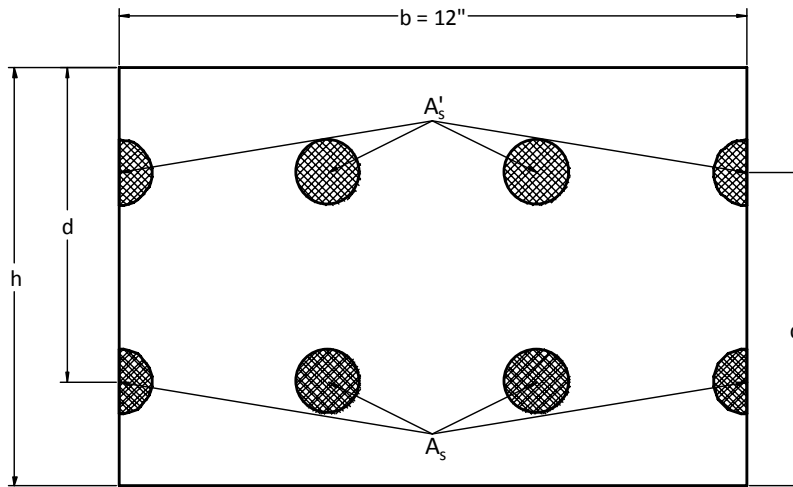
TOP SLAB CROSS SECTION LABELED FOR POSITIVE BENDING.
